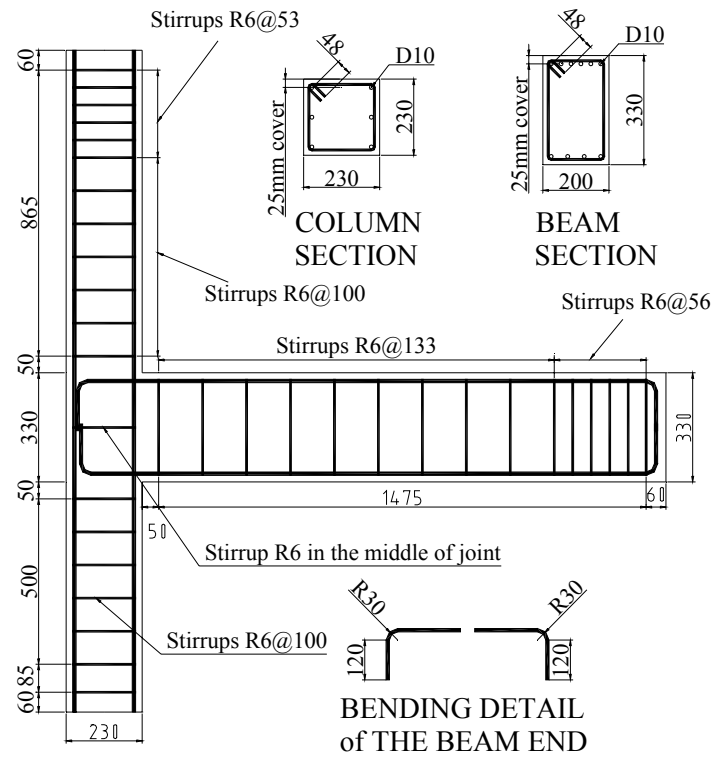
Dimensions and reinforcement details of the as-built specimen TDD2
